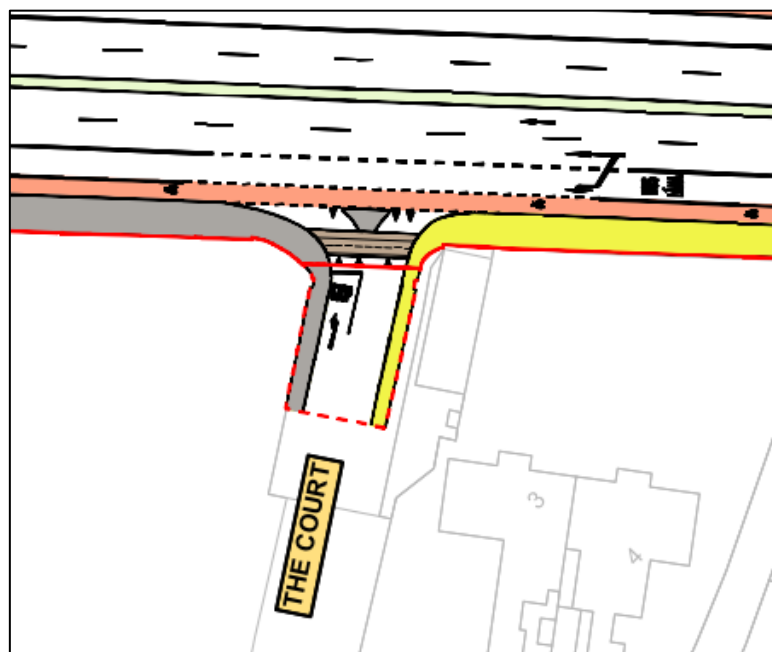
Extract from General Arrangement Drawing (Sheet 09)
